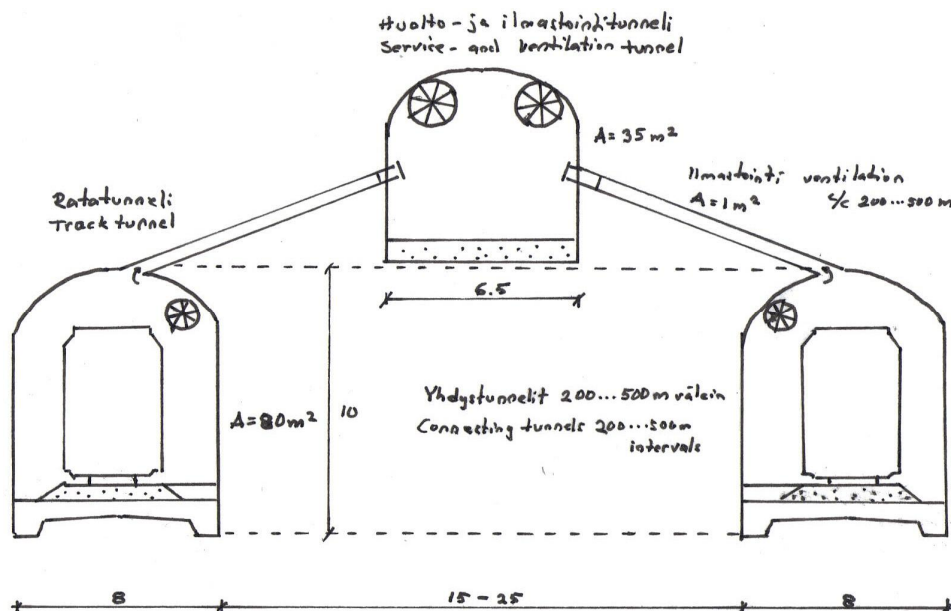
Cross-section of the rock tunnel under the sea. The standard cross-section has been obtained from illustration 19 in the 2003 general plan of the Greater Helsinki Ring Railway, to which a service and ventilation tunnel has been added (http://www.keharata.net/marja_yleissuunnitelmaraportti.pdf).
